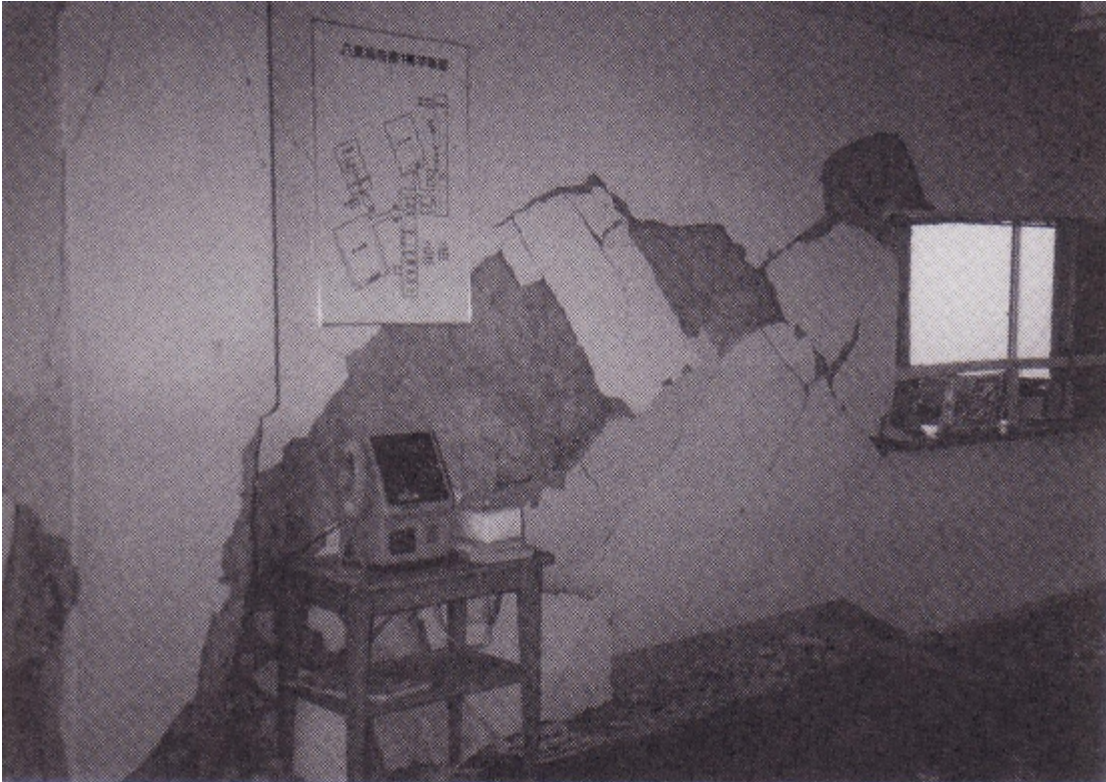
Covering concrete seriously came off and a number of diagonal cracks wider than 2 mm, but without buckling or deformation of reinforcement.
